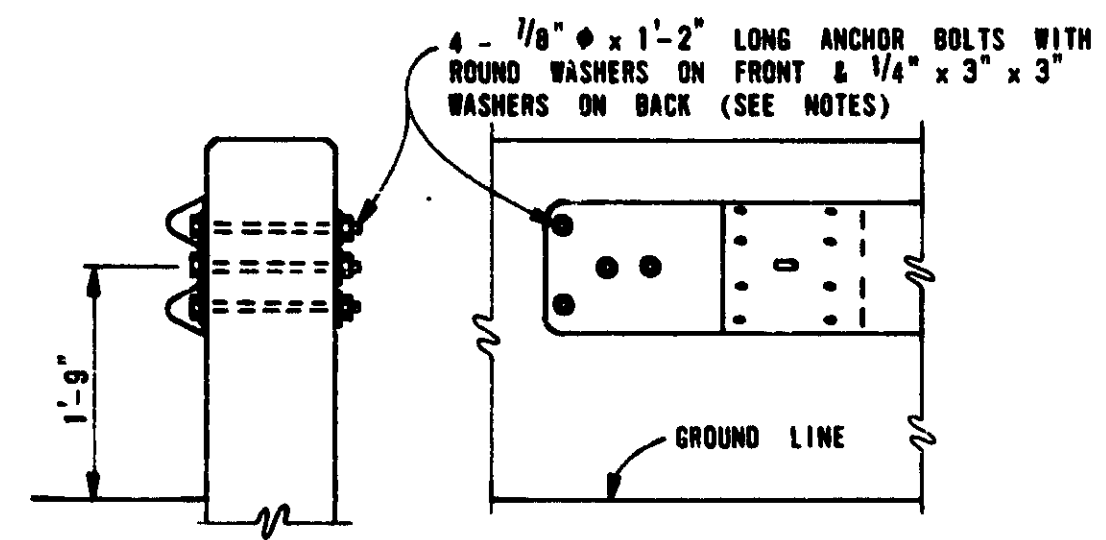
DETAIL OF CONCRETE BARRIER AT EXISTING SIGN TRUSSES.
